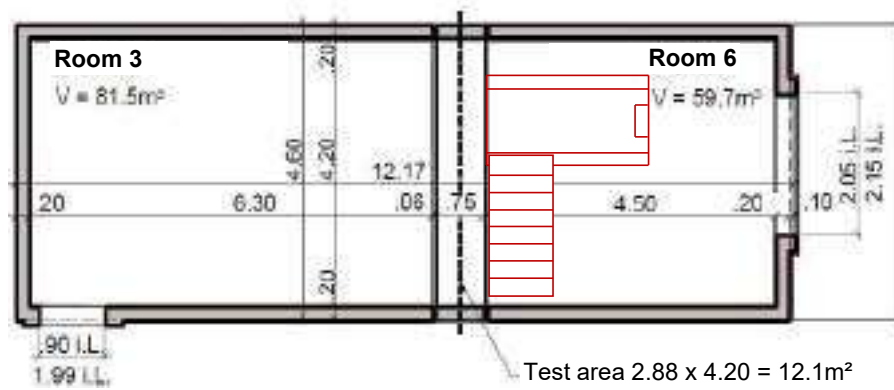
Second arrangement of stair flight and stair landing in the test facility.
